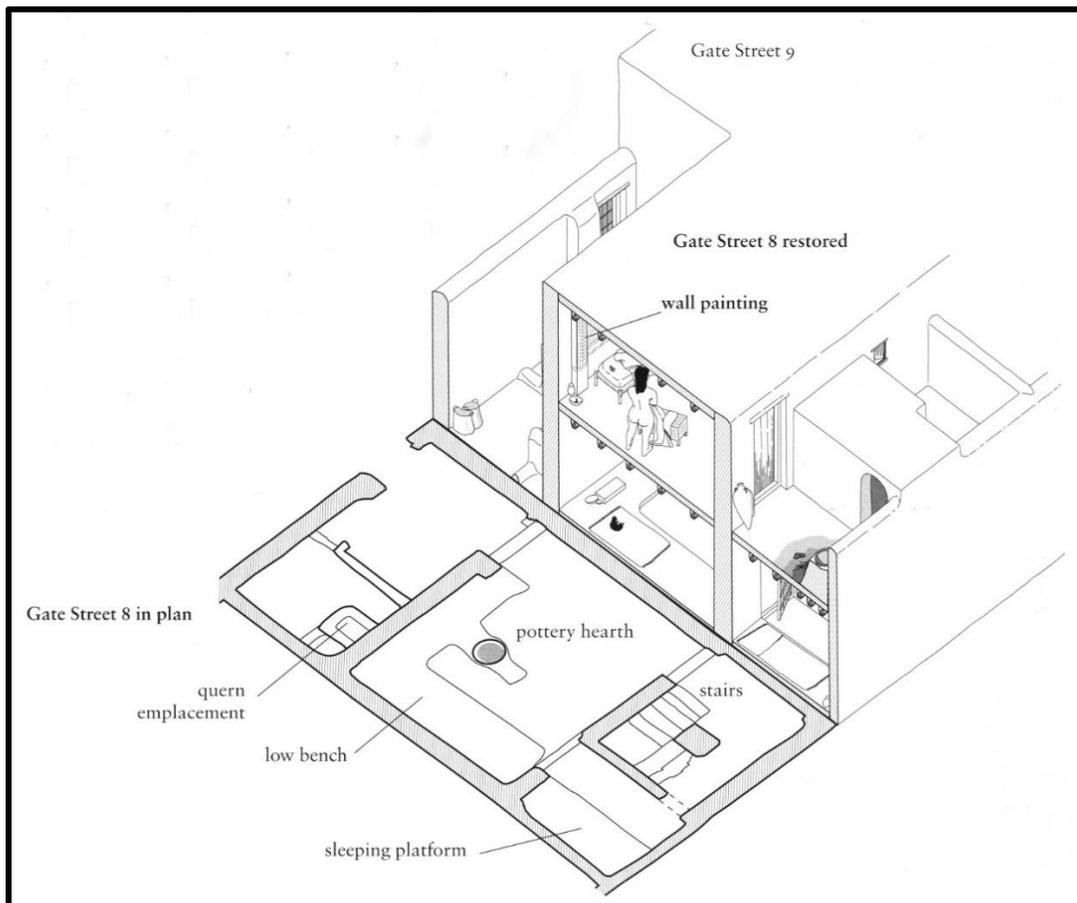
Reconstructed cross-section of the worker's house in Figure 49 [61]
